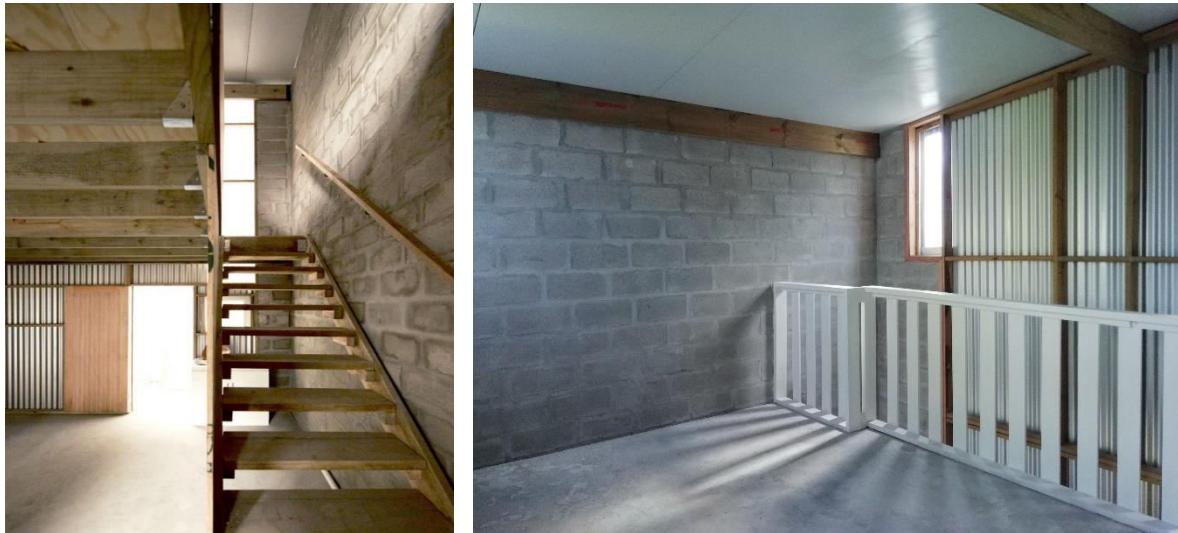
Ground floor interior of the Empower Shack. Dezeen.com, 2017, Figure 9: First floor interior of Empower Shack. Architizer.com, 2017.
